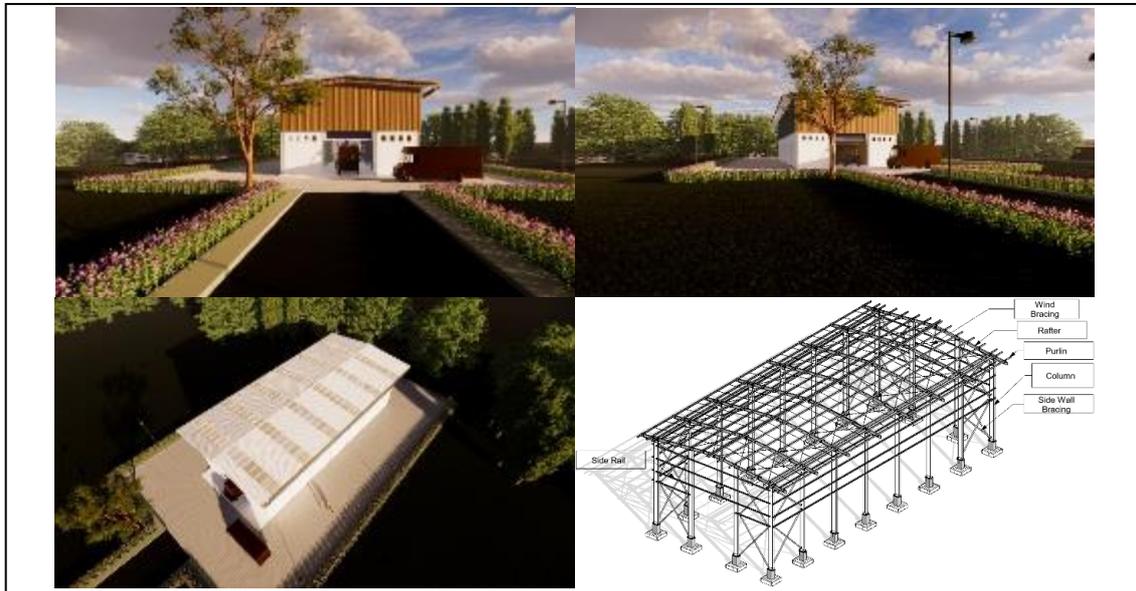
Revit: The 3D shape of a 15 m span industrial building plan (model 1)
